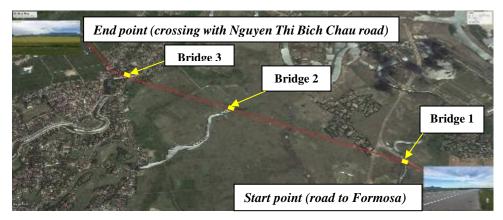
Layout on The Trunk Road Connecting Urban Centers
